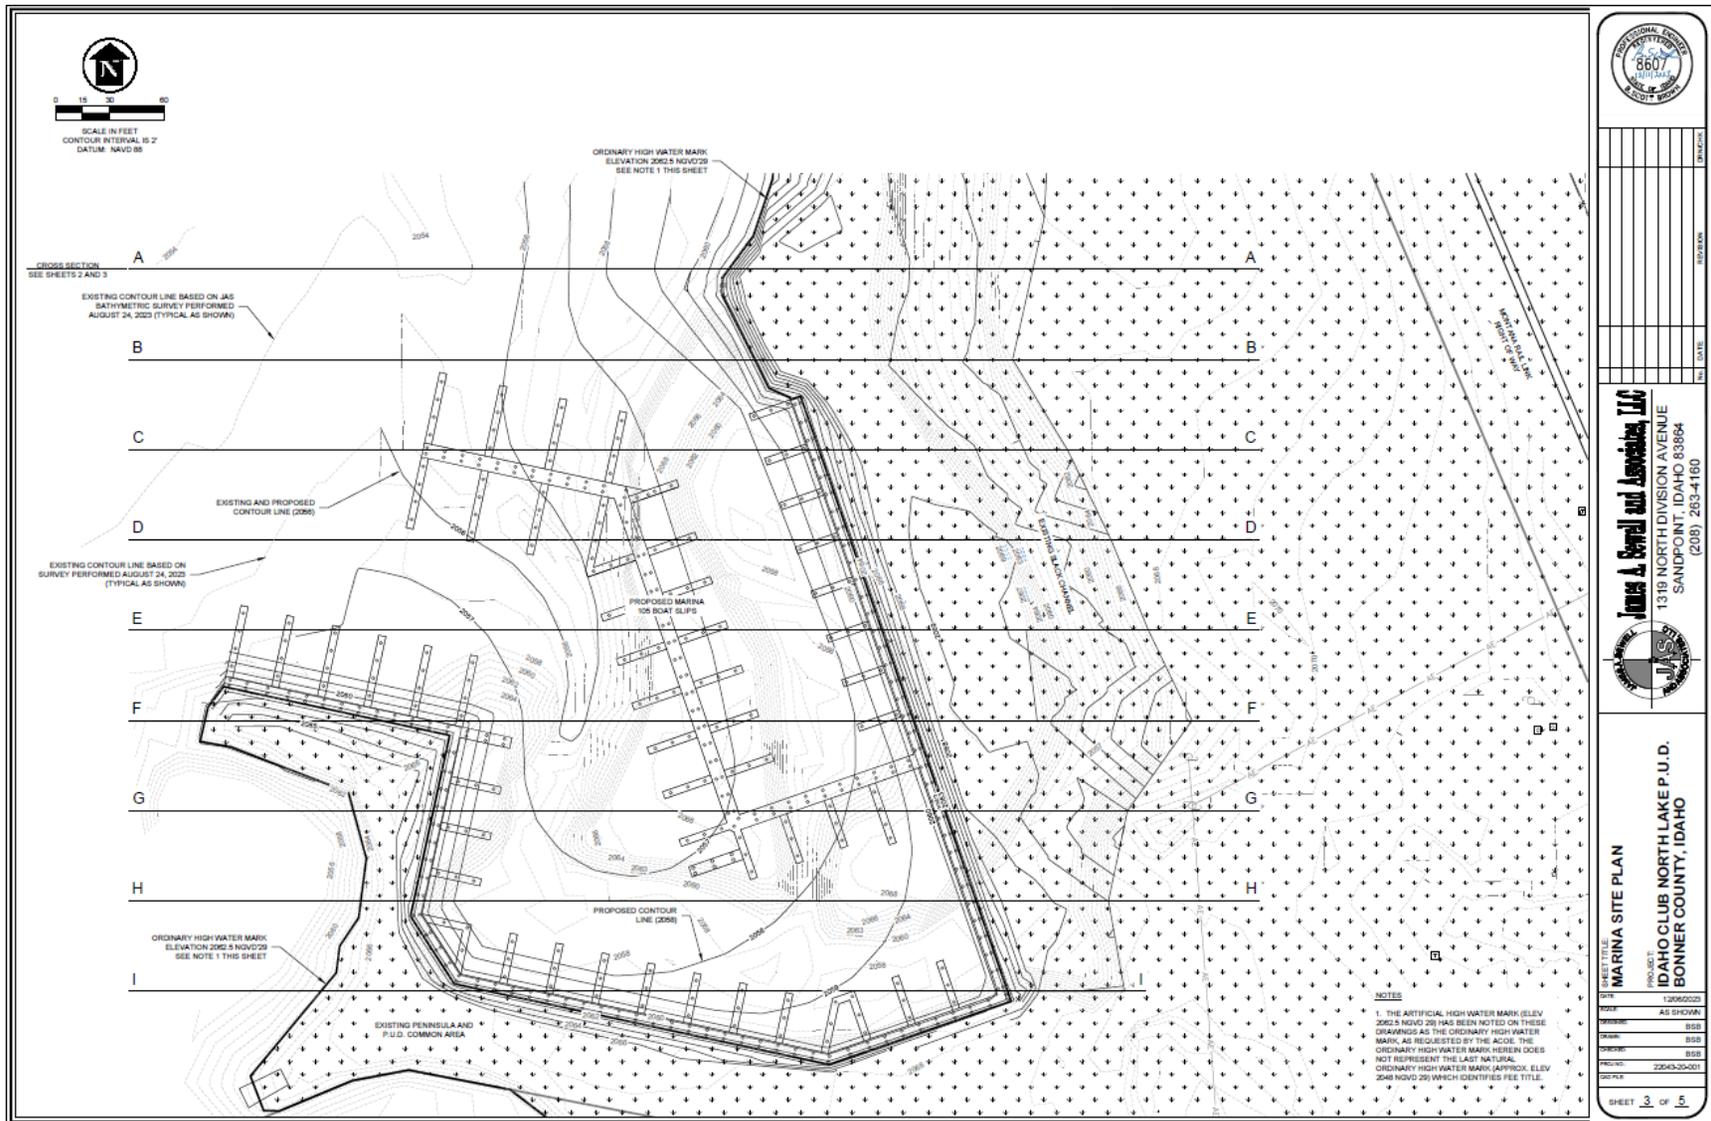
Engineering Drawing of Final Proposed Project at Site (J.A. Sewell & Associates, 2023b).
